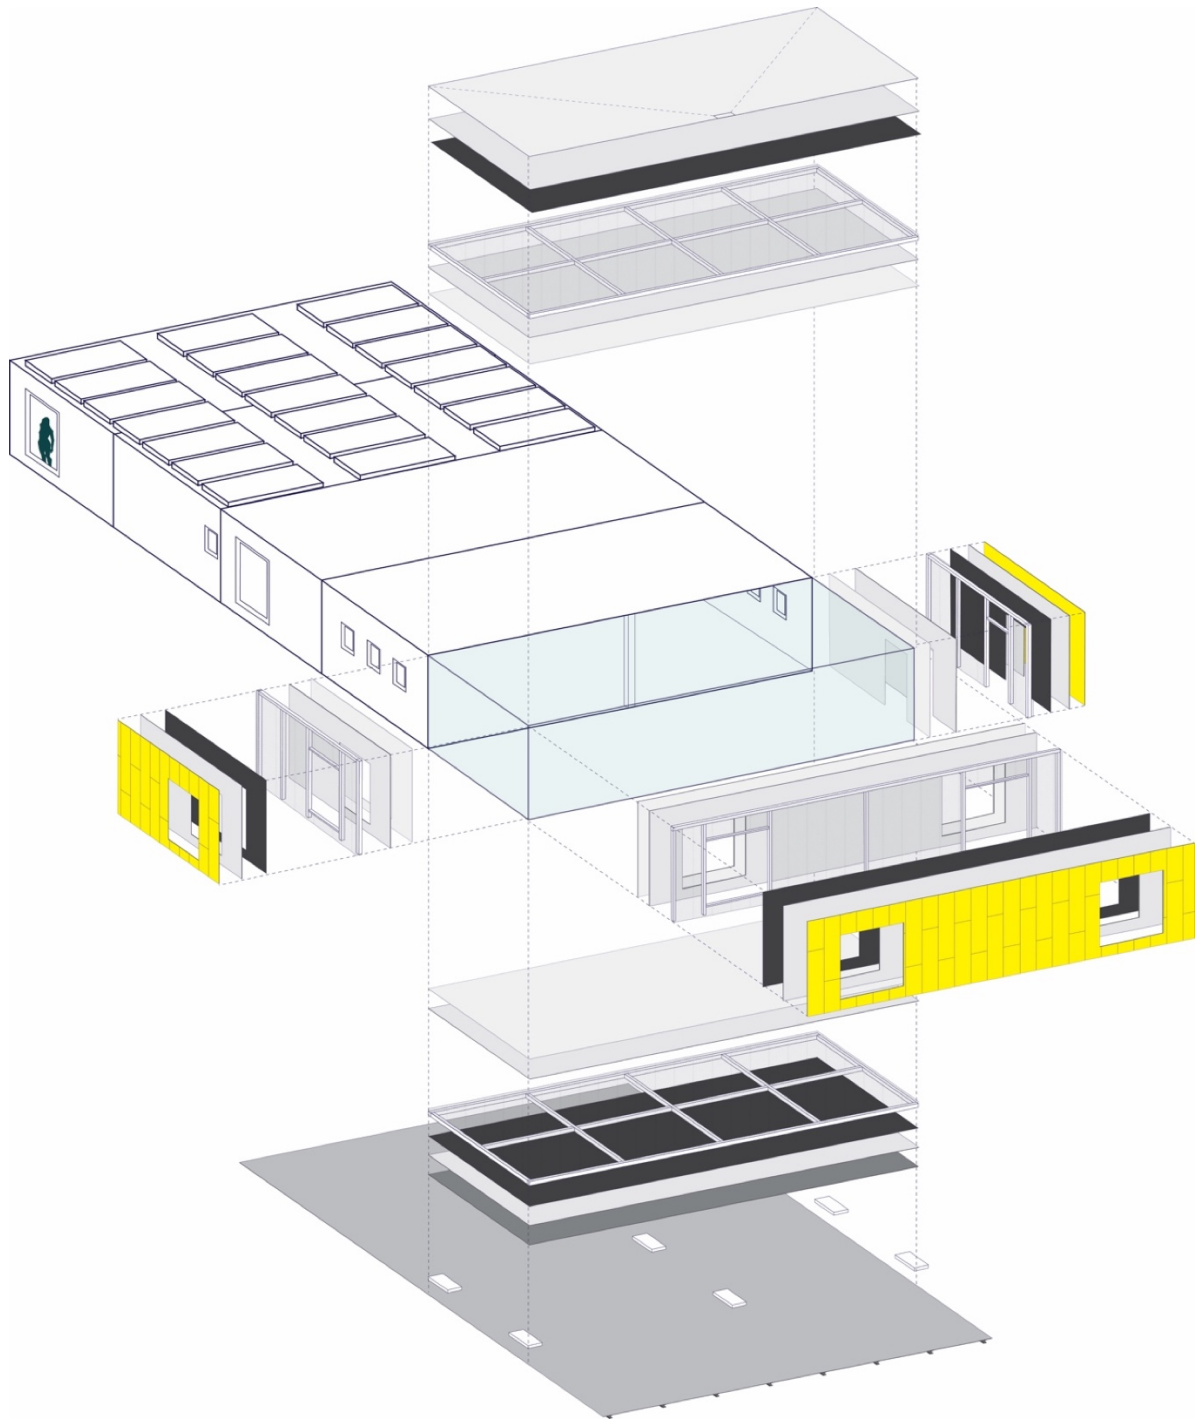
Exploded axonometric drawing of the structure of a module. The steel tube framing is infilled with soy-based spray foam. (Source: author)
